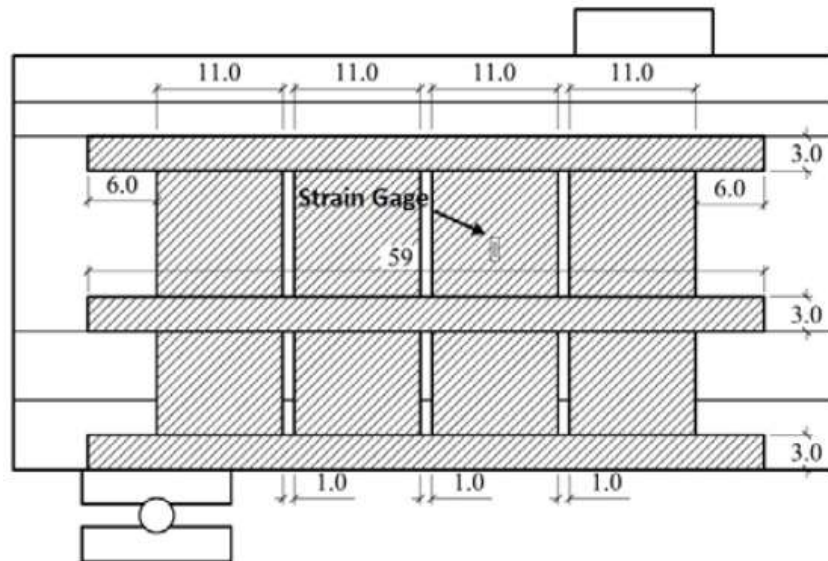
Longitudinal FRP strip anchorage detailing for full-scale specimens (from Andrawes et al., 2018).
